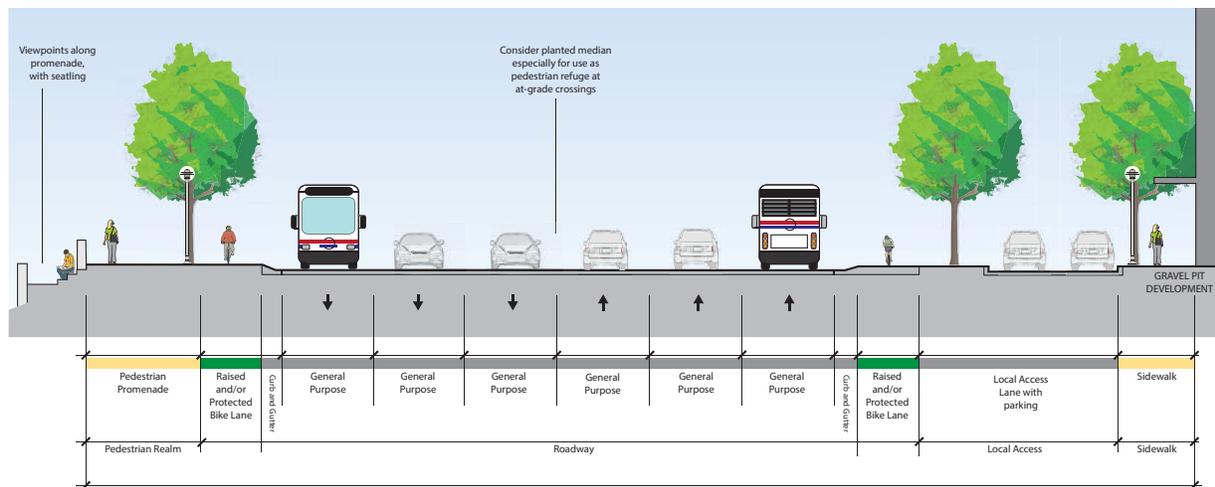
Illustrative street cross section concept for Wasatch Boulevard in the Gravel Pit area.
